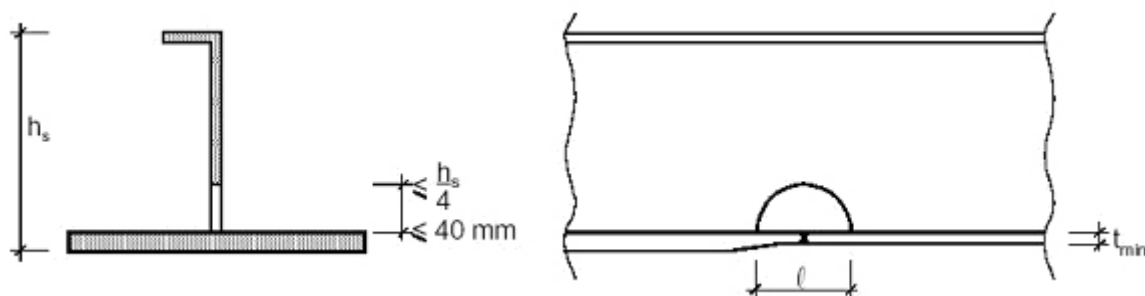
a. Cut-outs in longitudinal stiffeners
